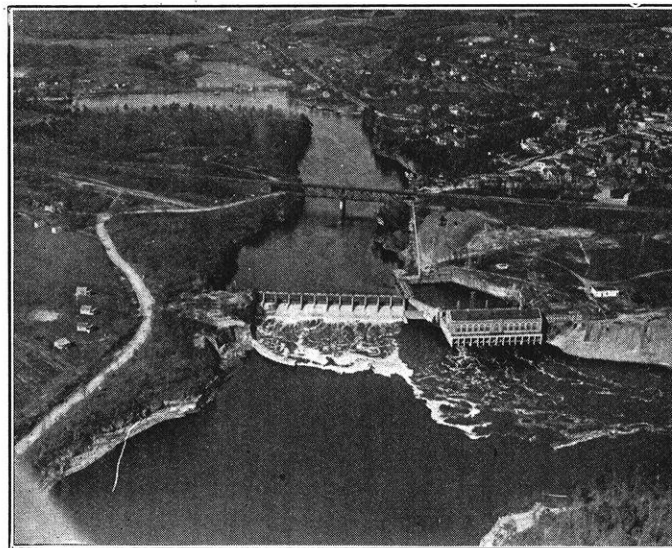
AIRPLANE PHOTOGRAPH OF KILBOURN HYDRO-ELECTRIC PLANT SHOWING DEFLECTING WALL IN ACTION
